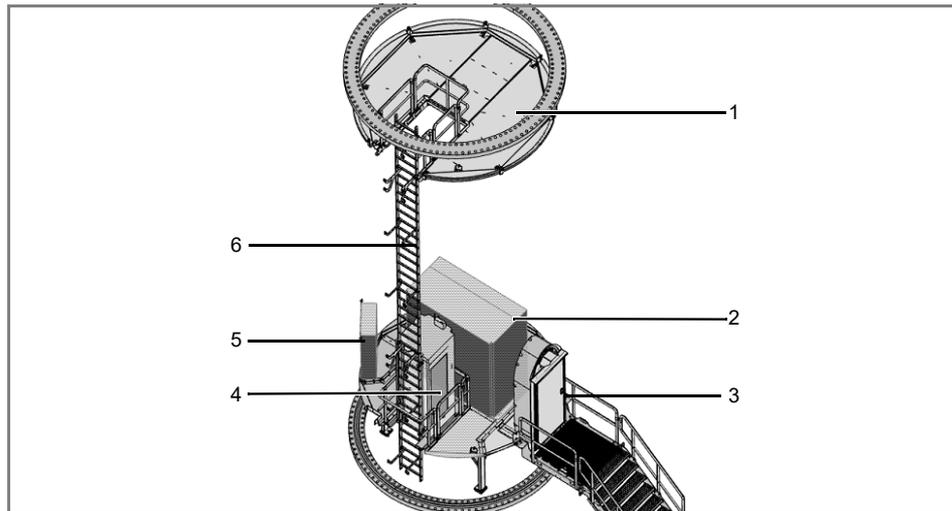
Overview of installations in the bottom section of the steel tube tower
